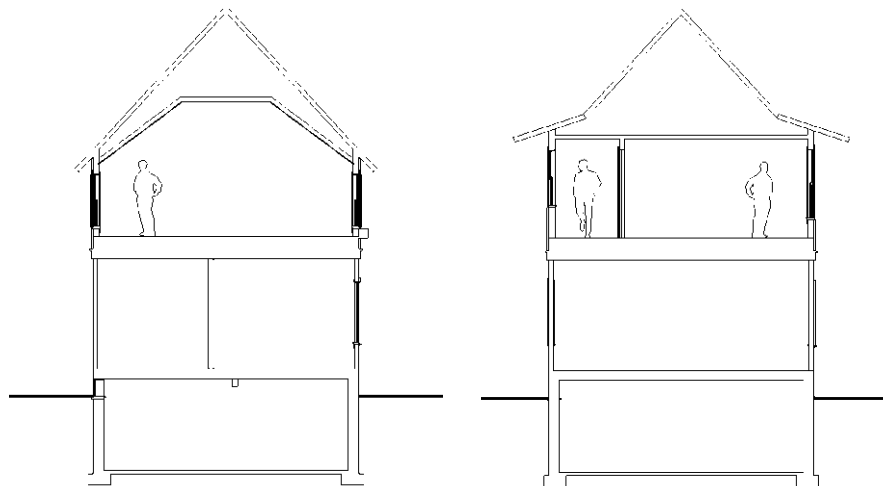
A little more money can buy a 13/12 roof with bedroom ceilings that start at 5 feet 6 inches before soaring to 10 feet (above left). The low spring line at the eaves creates a feeling of intimacy, while the high ceiling in the rest of the room adds flair. The lower 7-foot-6-inch ceilings created by the second truss configuration over the bathroom, stairs, and hall — which combines an upper 13/12 pitch with a lower pitch of 4/12 — make the bedrooms feel grand (above right).
